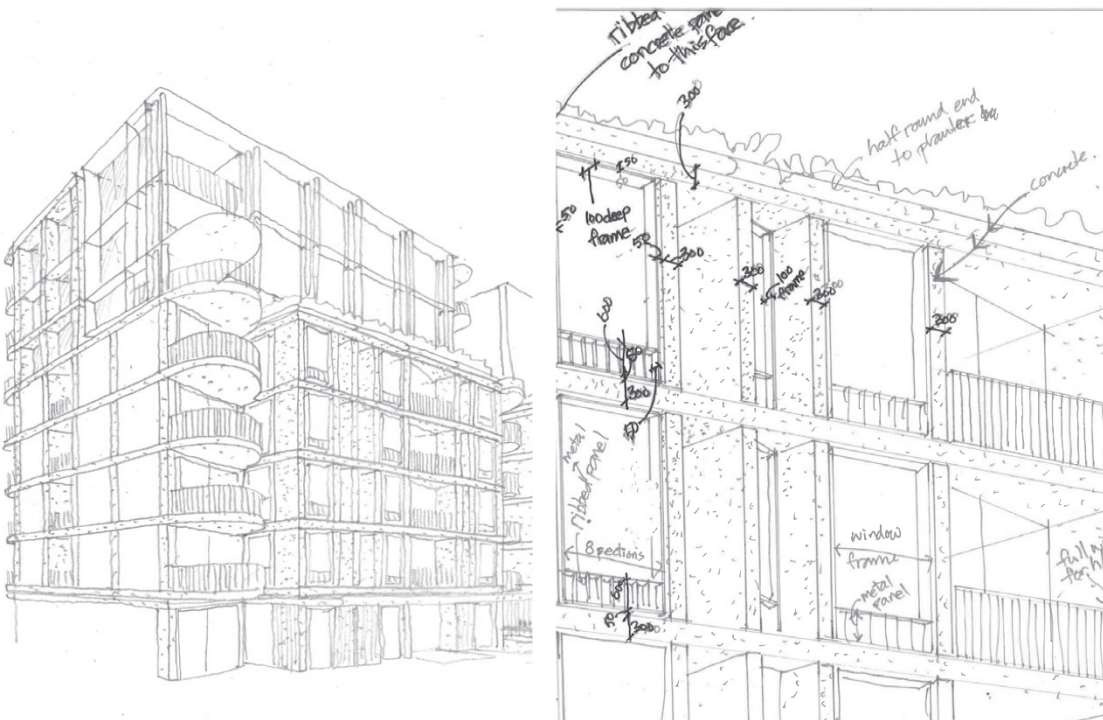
Sketches of the proposed scheme including facade detailing (Source: WMK Architecture)
